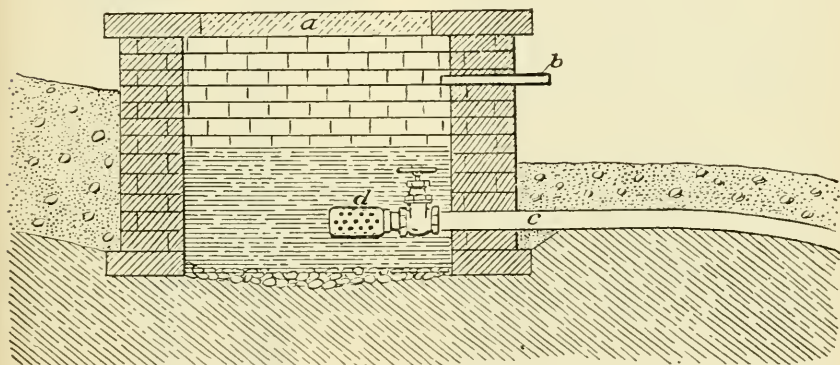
Properly protected spring with top entirely covered with concrete slab, A; overflow pipe, B; drain pipe, C, to be used when water is to be piped to a distant point; and strainer, D.
